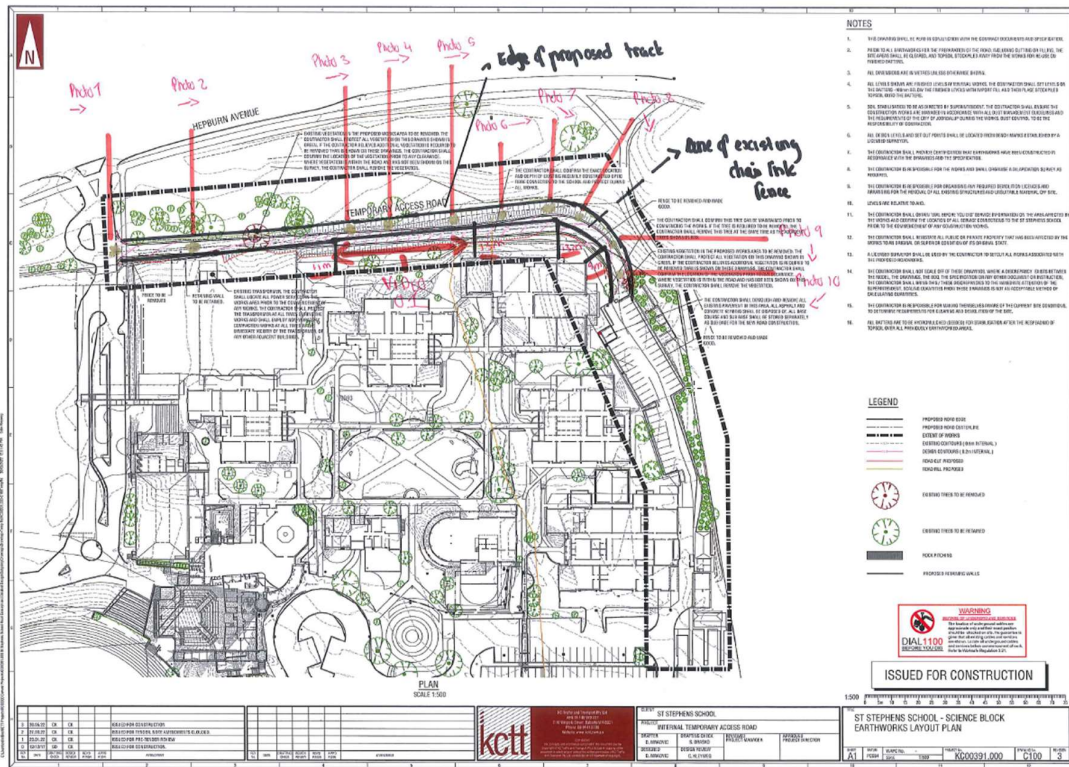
The site plan of the school building project and locations of the corresponding photographs in Figure 3.
